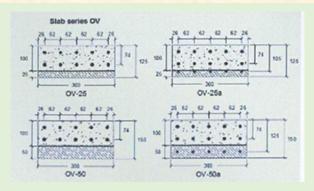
Details of strengthening configuration, sectional dimensions and reinforcement
